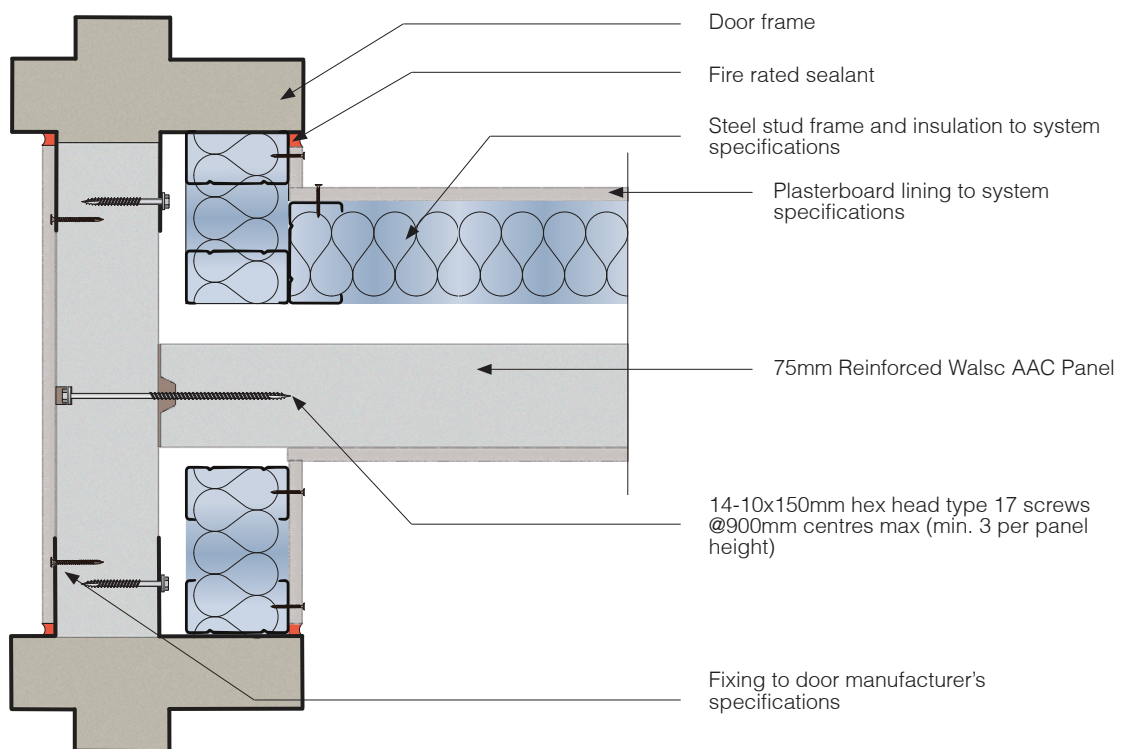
Intertency Wall to Corridor at Door Frame T Junction
